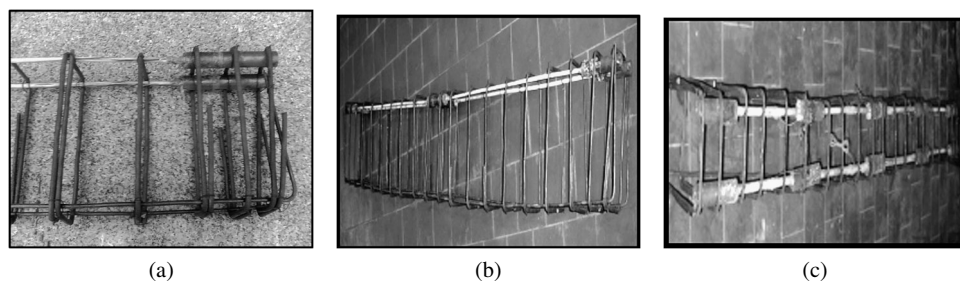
Details of beams reinforcements. Bars with anchors: (a) two, (b) three and (c) five.
